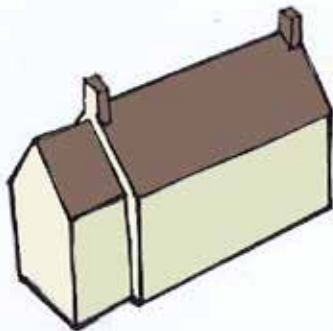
Examples of positive designs for side and rear extensions in Cliffe, Kent.
